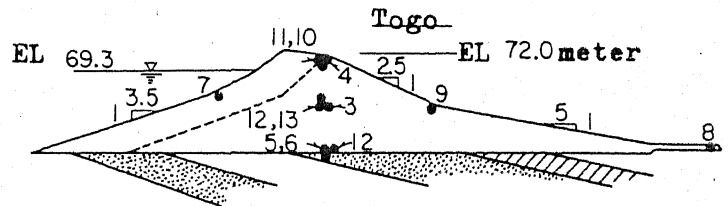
Cross section of Togo earth fill dam and location of pick-ups
